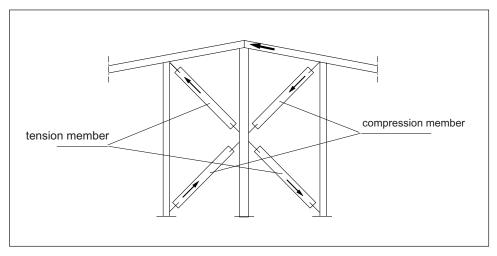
Bracings on the short side (the load at the ridge is transferred to the tension brace)
